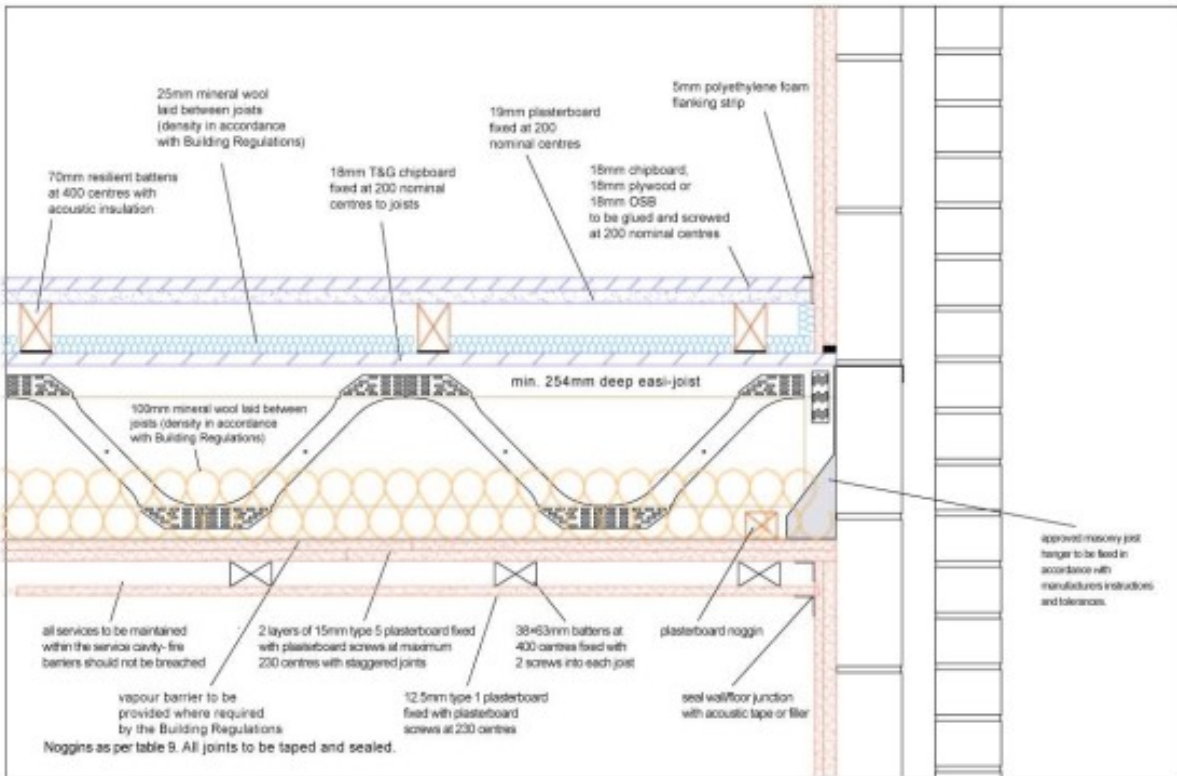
Cross section; easi-joist compartment floor construction; Junction with masonry wall; 60 minutes fire resistance
